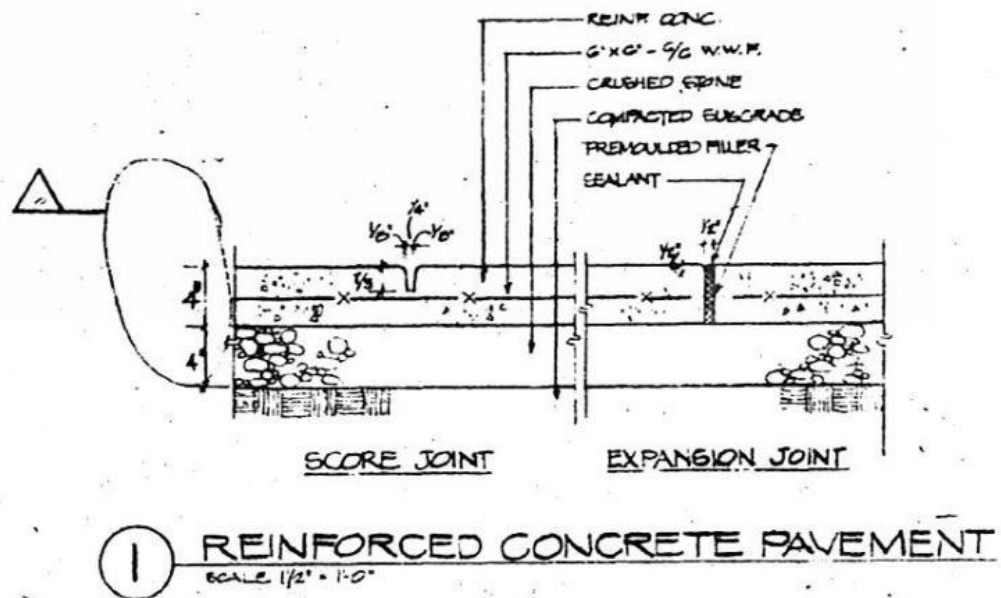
Original reinforced concrete pavement detail, Detail 1, SP-9 in Appendix A
